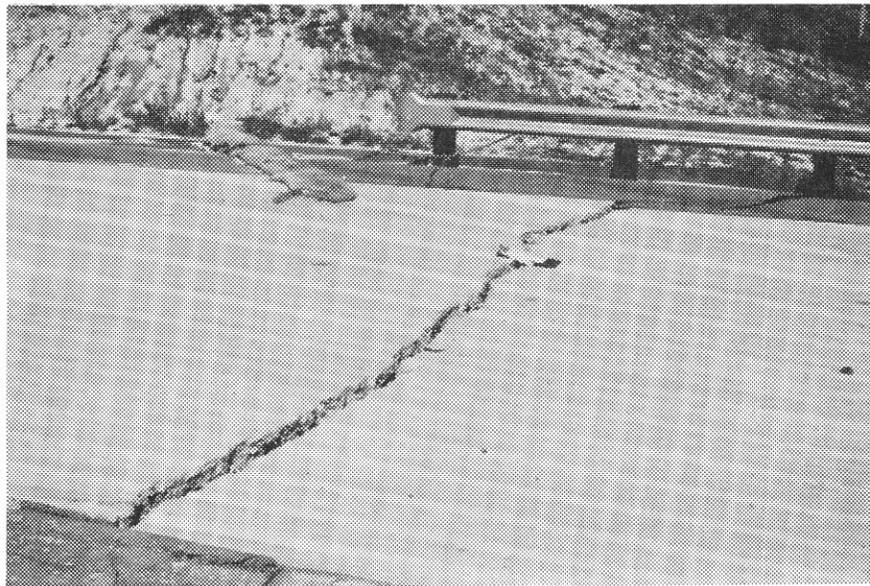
Looking northerly at transverse pavement crack at the cut/fill contact on A-Y Connector. Note horizontal and vertical separation along crack.
